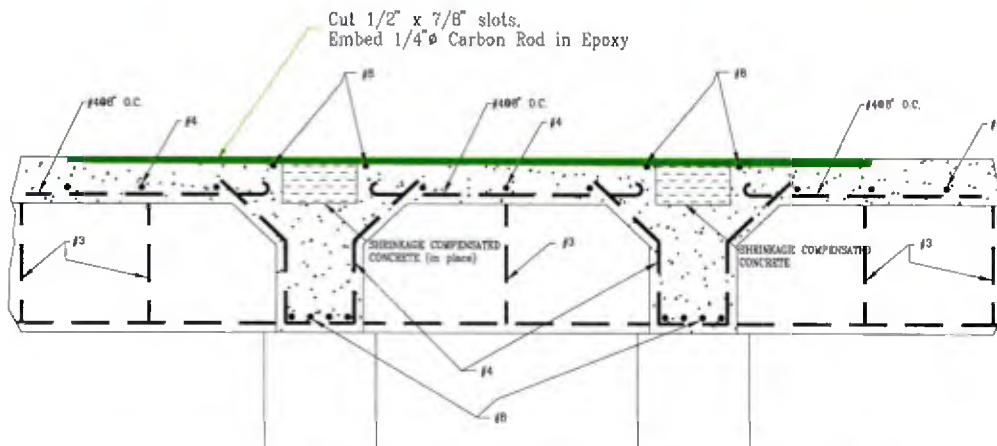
Embedded carbon composite rod to upgrade main deck strength adjacent to rail beams.
